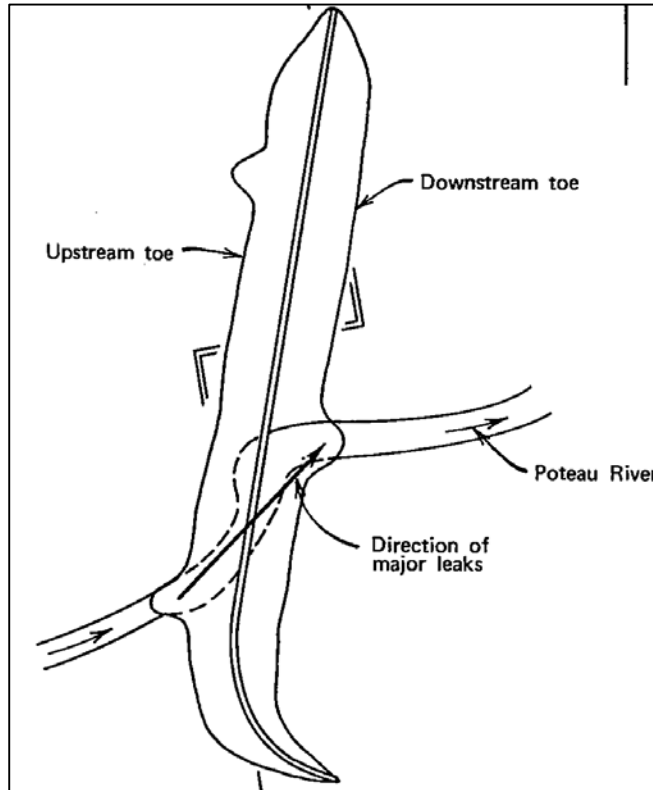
Plan view of Wister Dam (after Bertram 1967).
